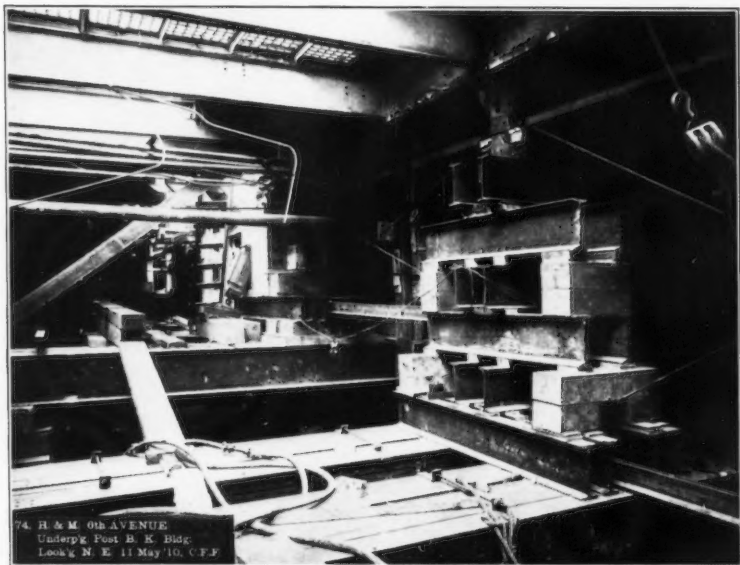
STEEL UNDERPINNING OF A COLUMN OF THE BROWNING-KING BUILDING.
